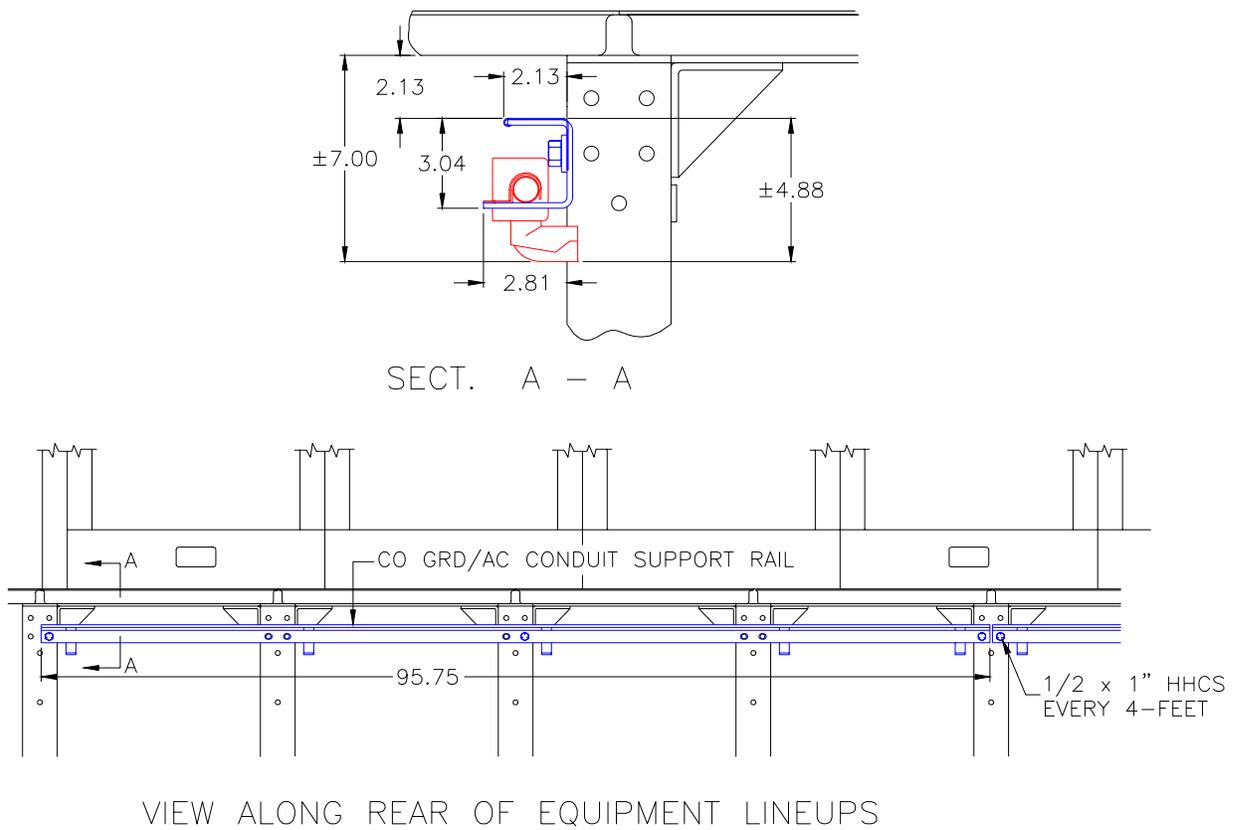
C – Lineup Ground and AC Conduit Support Rail
